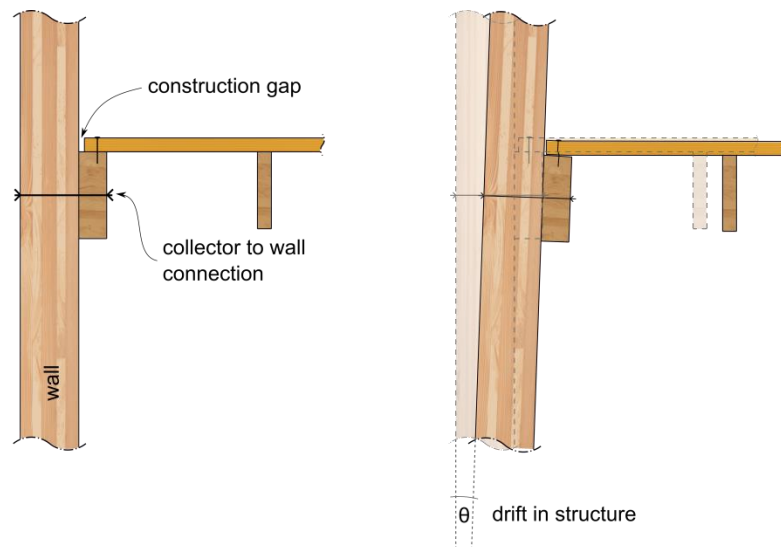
Construction gap between a timber floor and supporting beam to allow for rotation undeformed state (left) and deformed stat (right)
